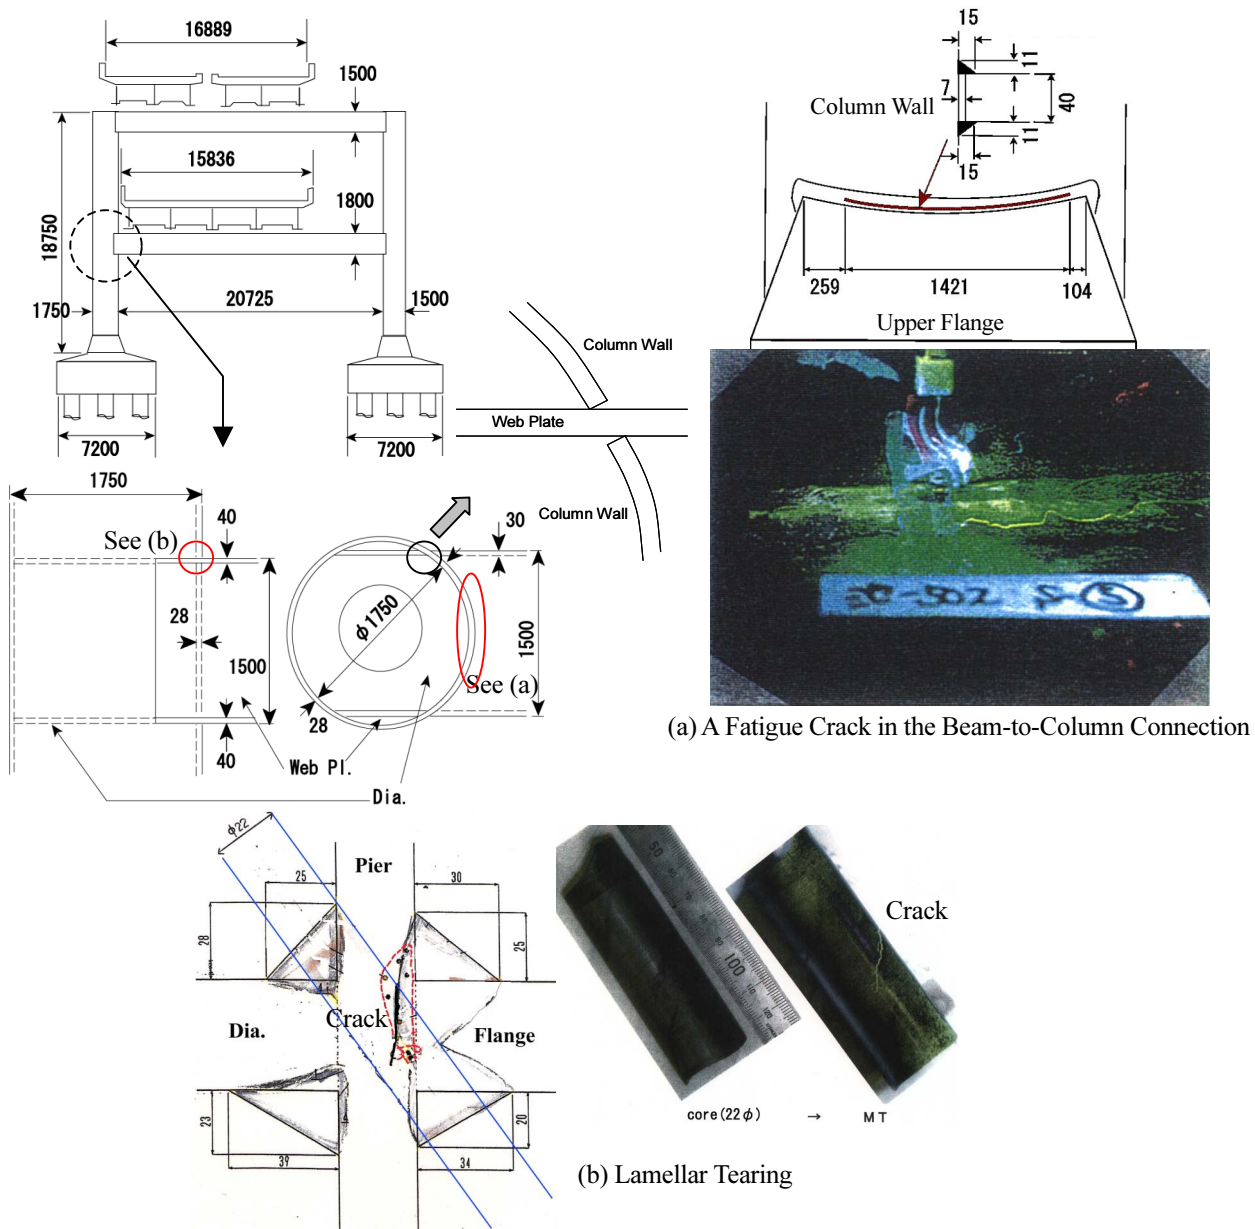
The Fatigue Crack and Lamellar Tearing during Retrofitting Works by Welding in a Steel Bridge Pier
